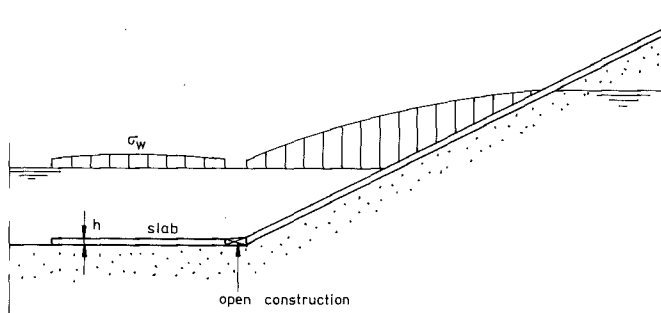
Hydraulic uplift pressures under a slab at the front of a dike.
